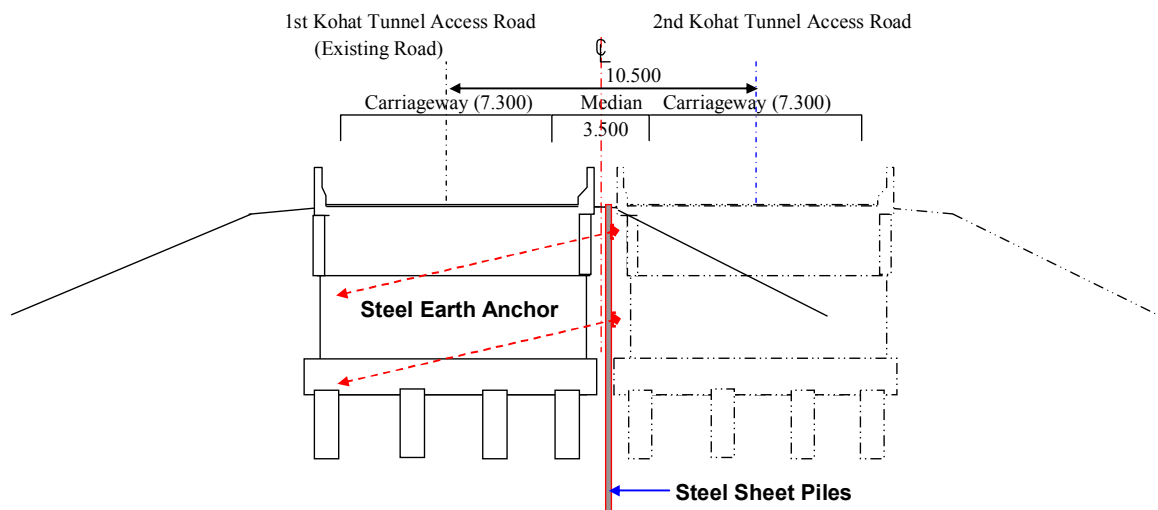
Temporary Structure Sustaining Measures for New Bridges Construction
